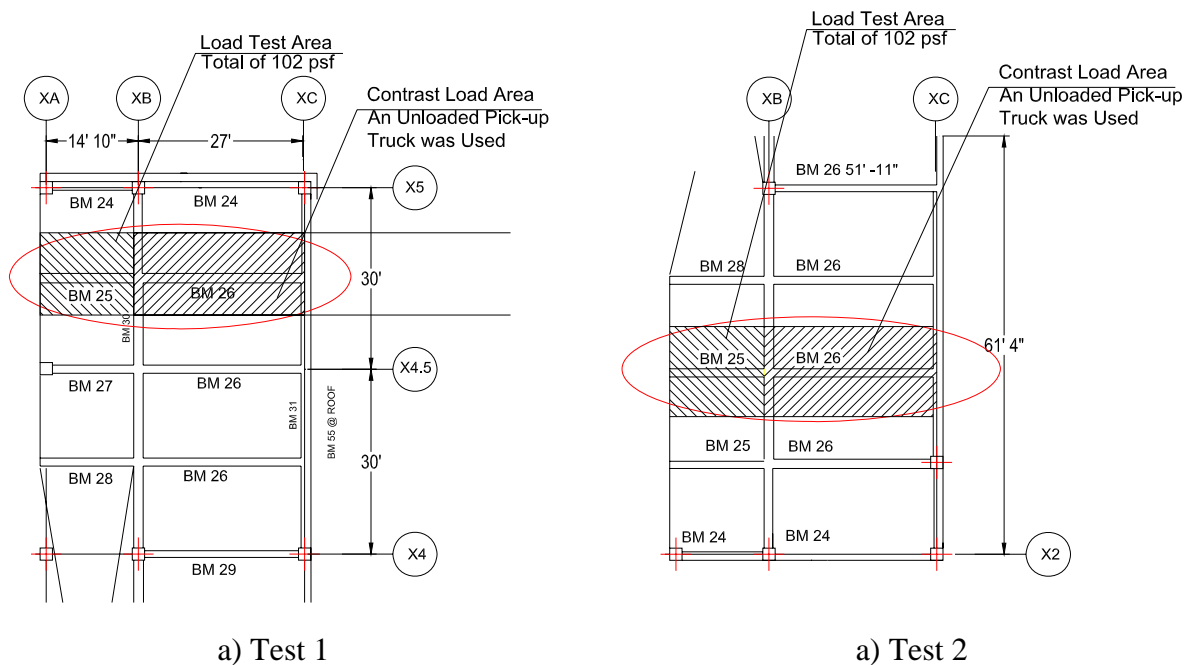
Plan View Detail of the Two Cantilever Portion Under Investigation
